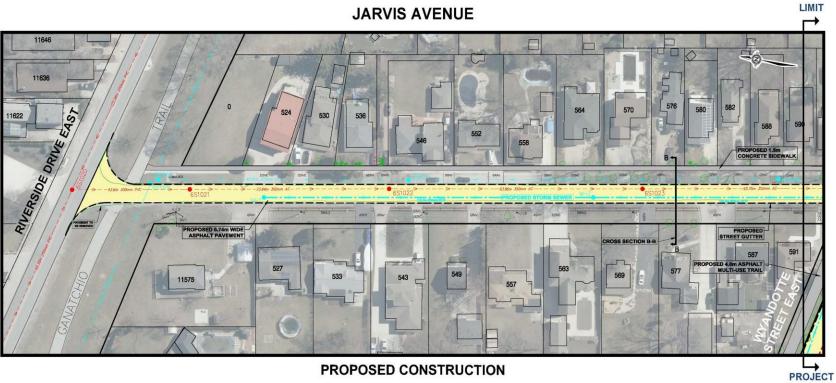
Recommended Design (Plan View) - Jarvis Avenue from Riverside Drive East to Wyandotte Street
